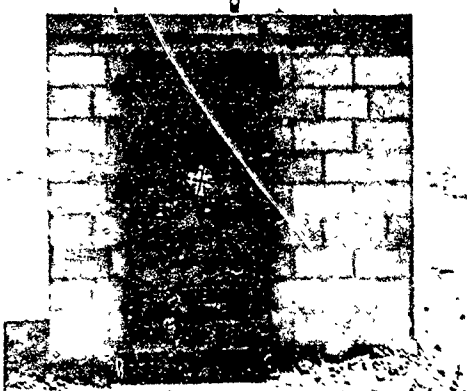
Exterior of masonry utility type shelter; Stations 1-34.1 g, j, and m.
